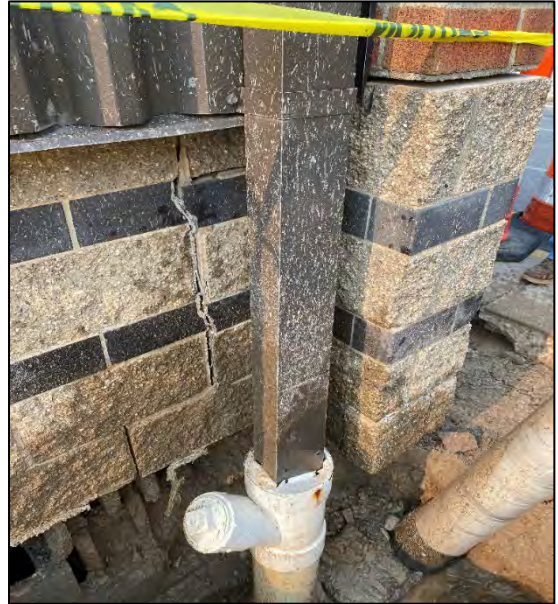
North Wall and Northwest Wing Wall Cracks
